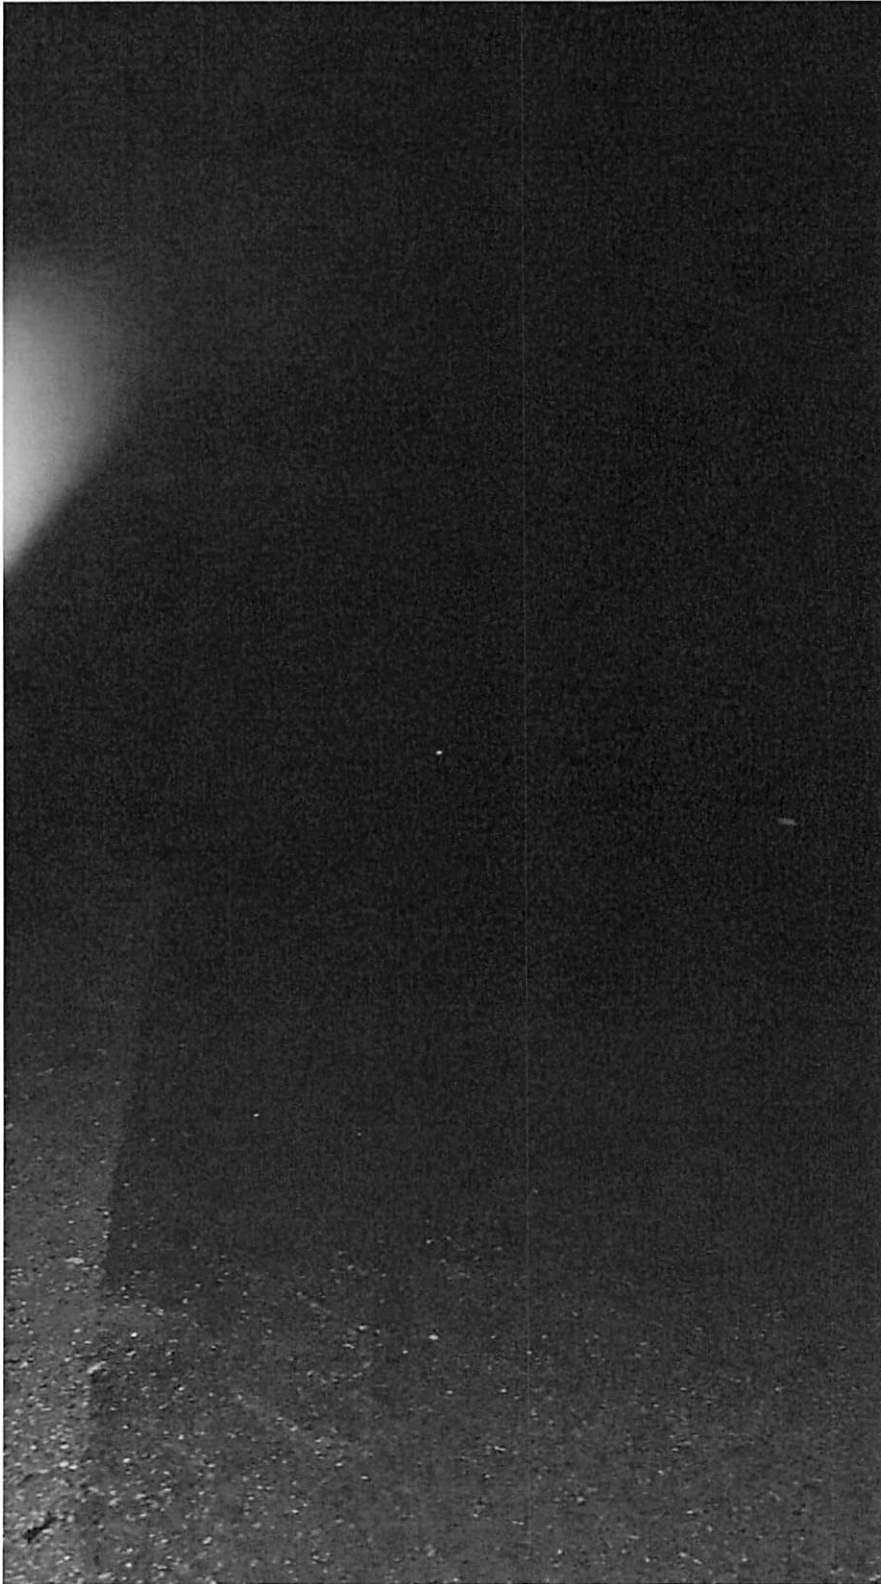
Look towards the right coming out of proposed new road site at 5:30 am on 9/15/2026
